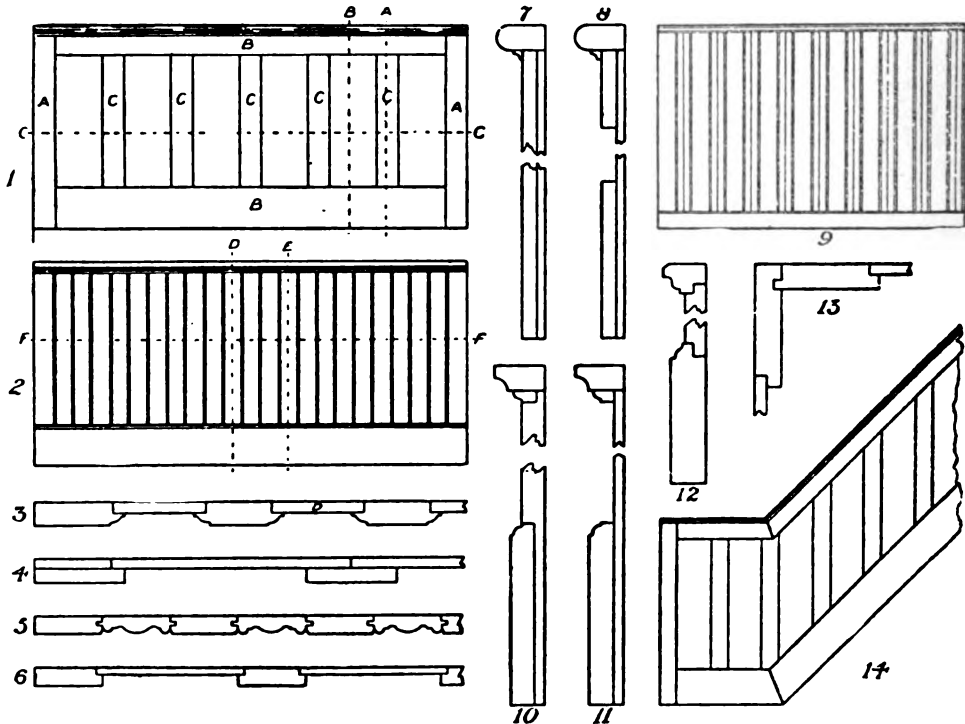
Elevation of Plain Sham Paneling. Fig. 2.—Elevation of Moulded Sham Paneling. Fig. 3.—Section of Fig. 2 on line FF. Fig. 4.—Section of Fig. 1 on line CC. Fig. 5.—Horizontal Section of Fig. 9. Fig. 6.—Alternative Section for Fig. 1. Fig. 7.—Section of Fig. 1 on line A. Fig. 8.—Section of Fig. 1 on line B. Fig. 9.—Another Style of Plain and Moulded Paneling. Fig. 10.—Section of Fig. 2 on line D. Fig. 11.—Section of Fig. 2 on line E. Fig. 12.—Vertical Section of Fig. 9. Fig. 13.—Joining Paneling at Right Angles. Fig. 14.—Staircase Dado in Sham Paneling.
